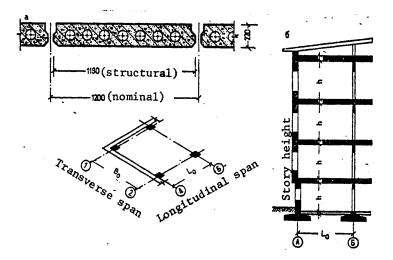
Basic forms of dimensions of structural products (a); space-floor plan parameters of buildings and structures (b, c).
